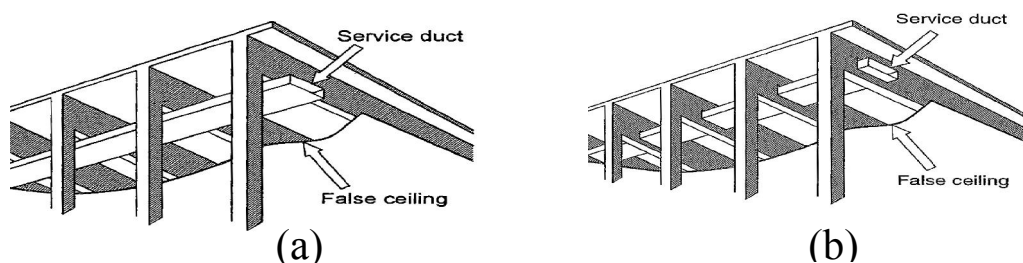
Typical Layout of Pipes for High Rise Building (Mansur and Hasnat, 1979).
